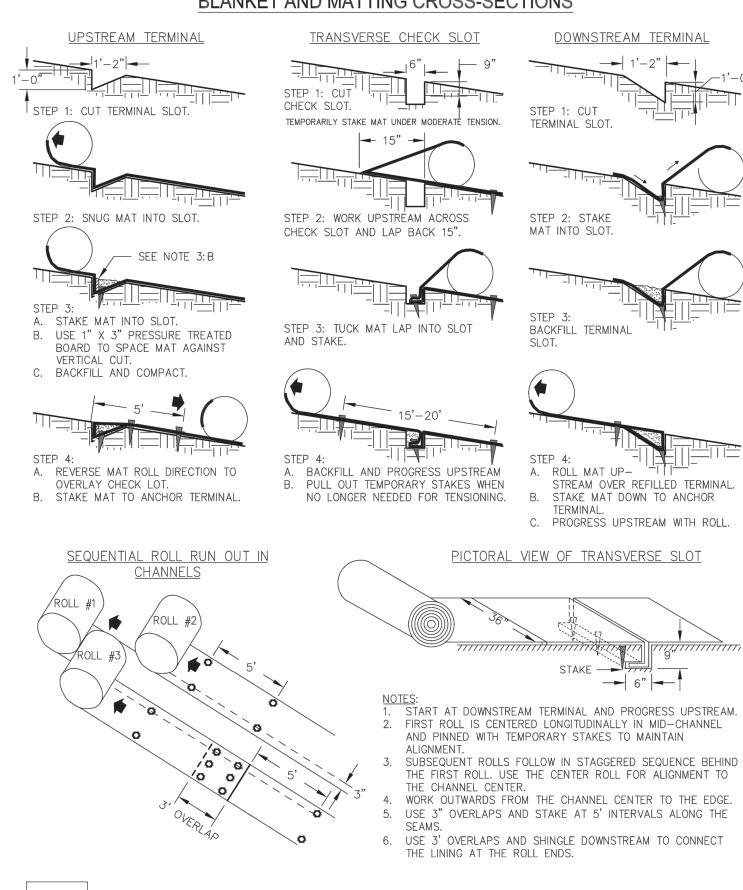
Typical Installation Guidelines for Matting and Blankets
